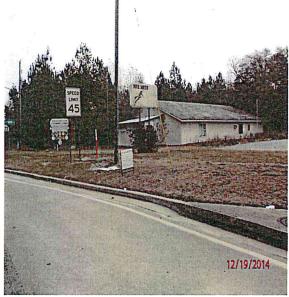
Site Entrance Shared with Flash Foods and small paved parking area. Veteran's Memorial Parkway crossing South Main in Background.
